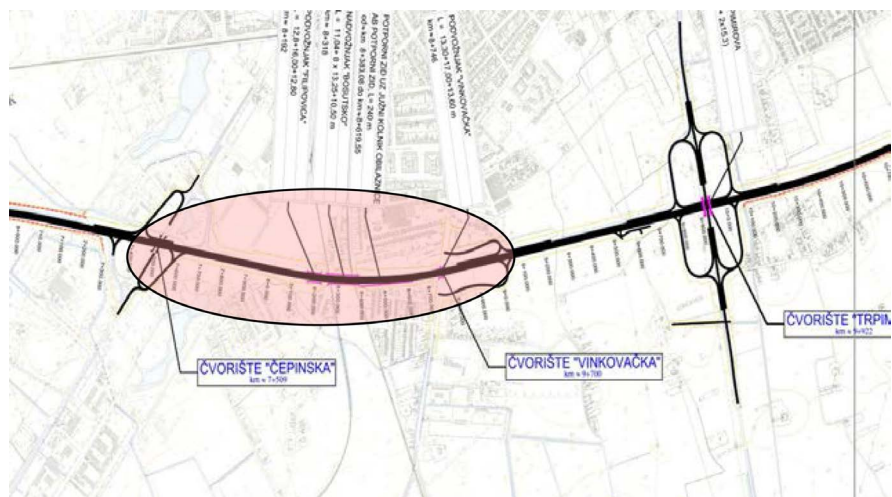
Part of layout drawing Southern bypass of Osijek: road section between intersections Vinkovačka and Čepinska [8]
